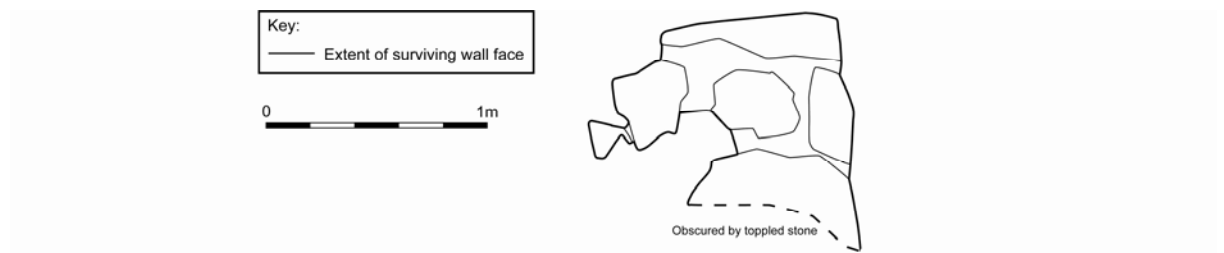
Structure 4, Rusticated Bridge #2 (Lower Bridge) - Elevation f
